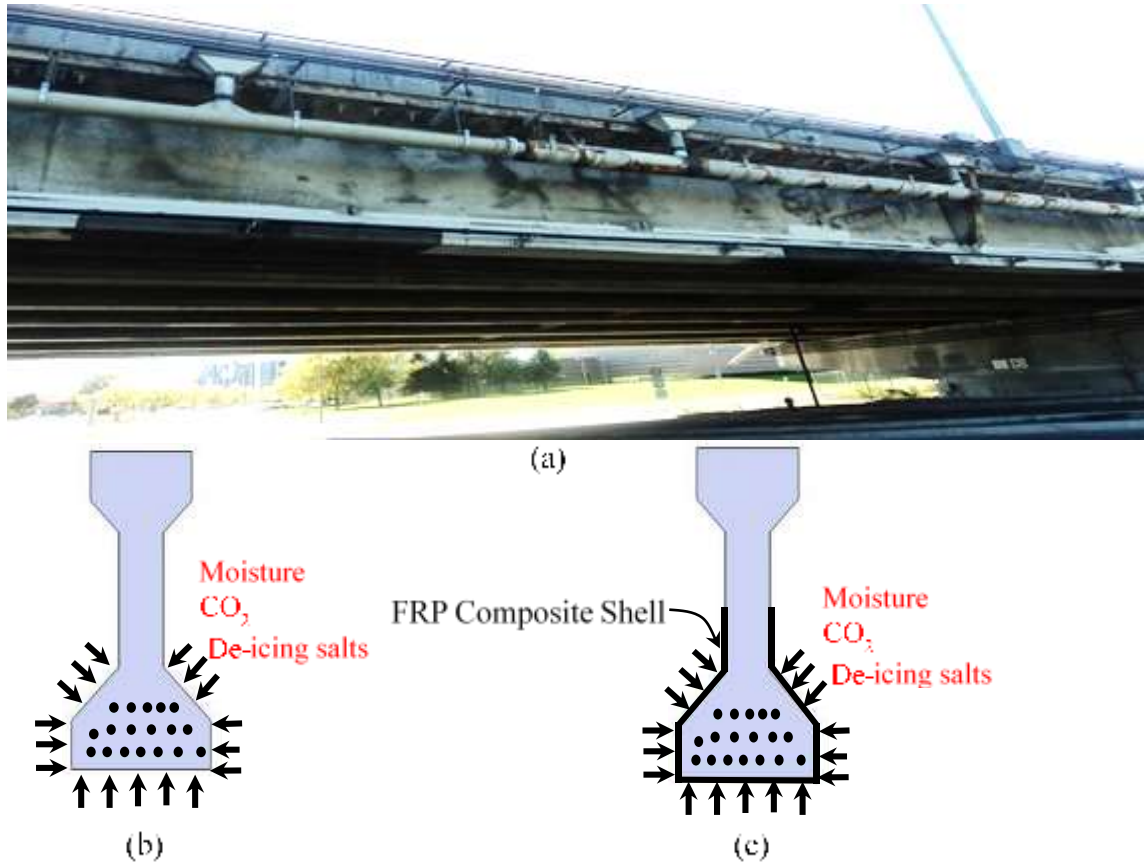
(a) Deteriorated prestressed concrete girder of the Champlain Bridge, Montreal (b) cross-section of prestressed concrete girder with ingress of harmful elements through permeable concrete (c) cross-section of prestressed concrete girder with an FRP shell on the lower flange
